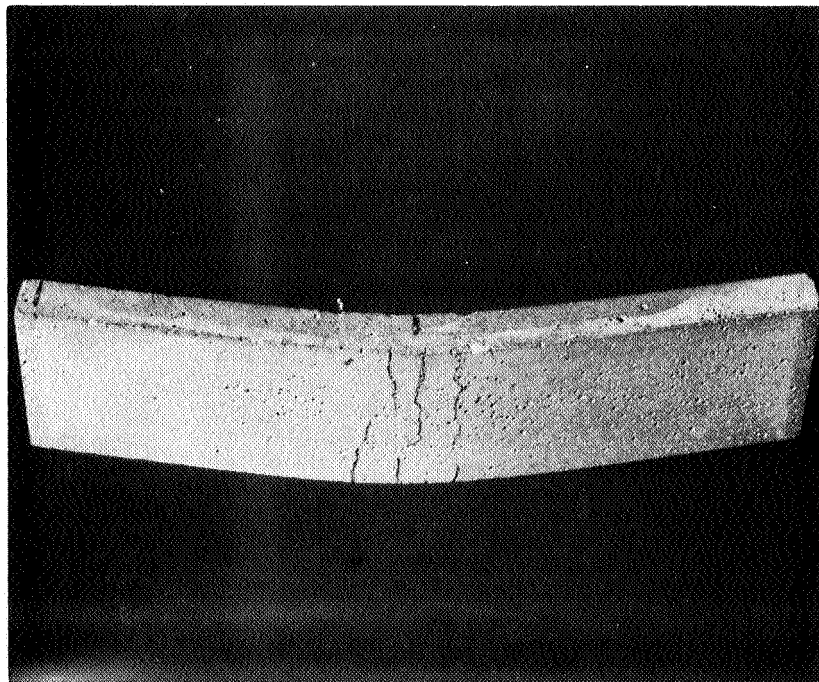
Failure by Excessive Deformation of Prestressed Flexural Specimen (3/4x)
